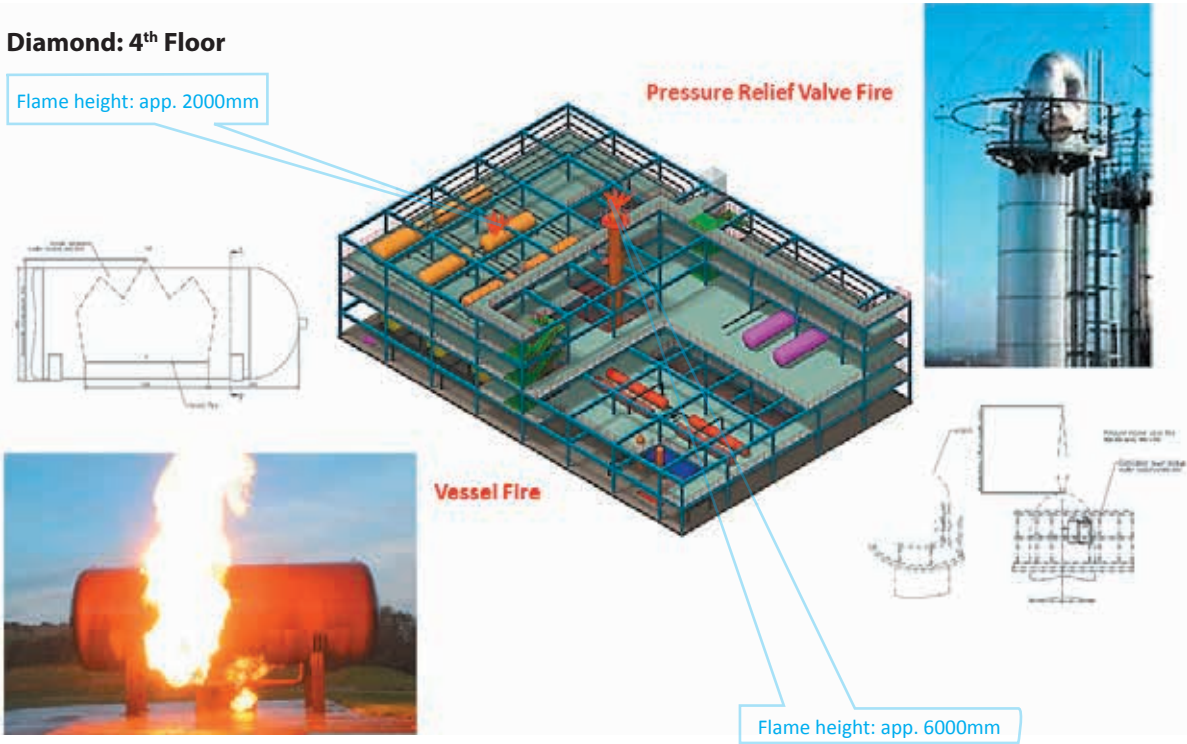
Schematic layout of the scenarios at Diamond 4th floor
